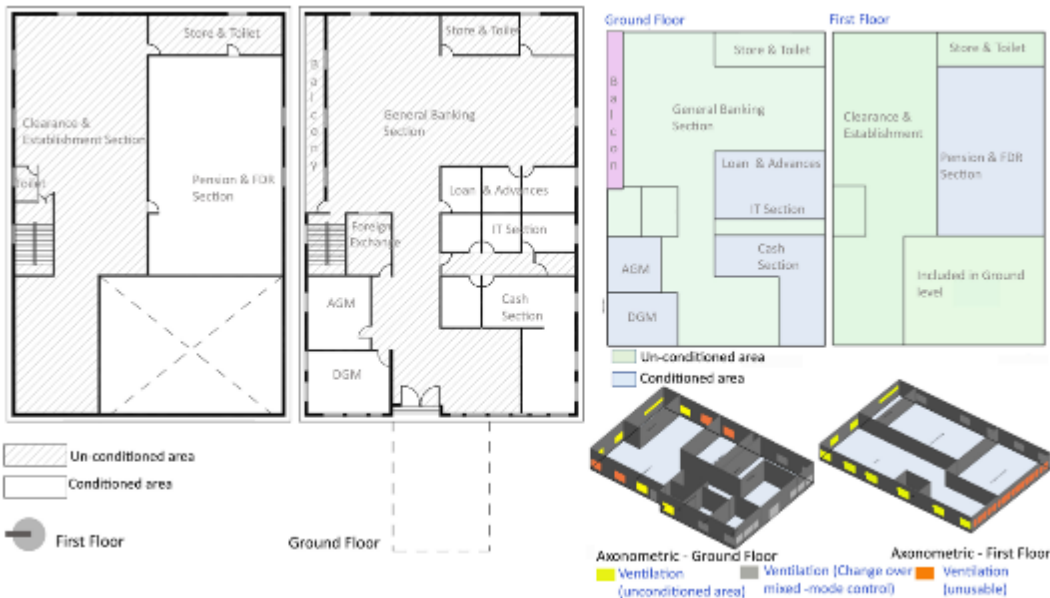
Floor Plans of Sonali Bank Building(left) & layout of plan defined by zone for Design Builder Simulation (right)
